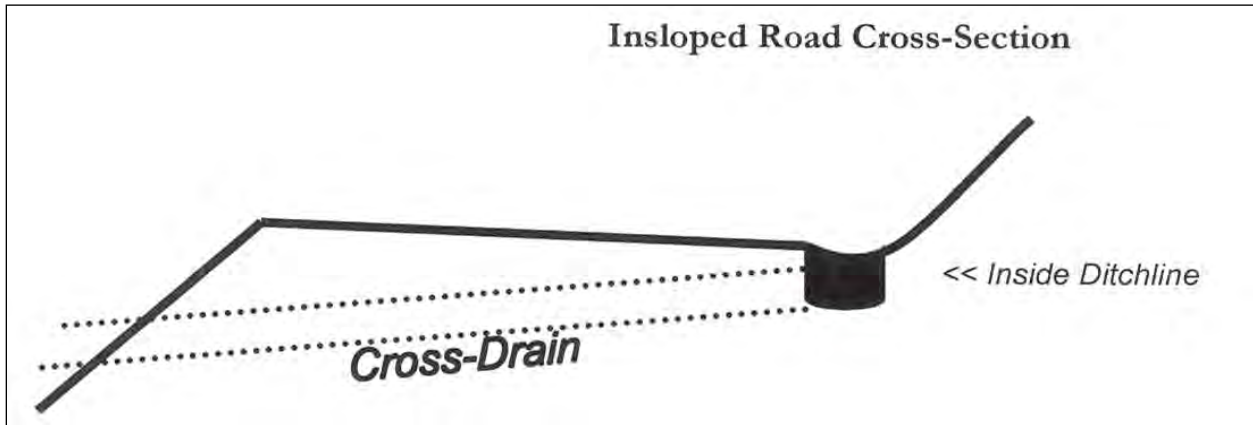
K: Schematic cross-sectional sketch of insloped road surface profile
